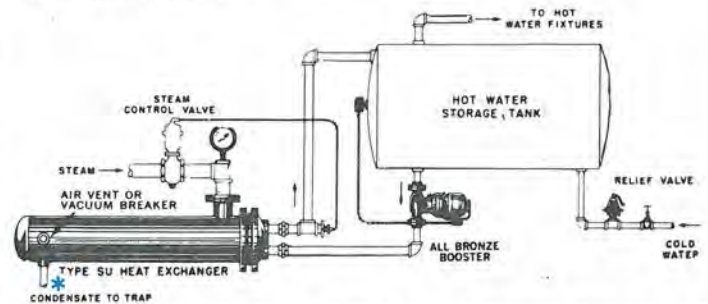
Typical installation of "SU" Heat Exchanger when used with storage tank.
